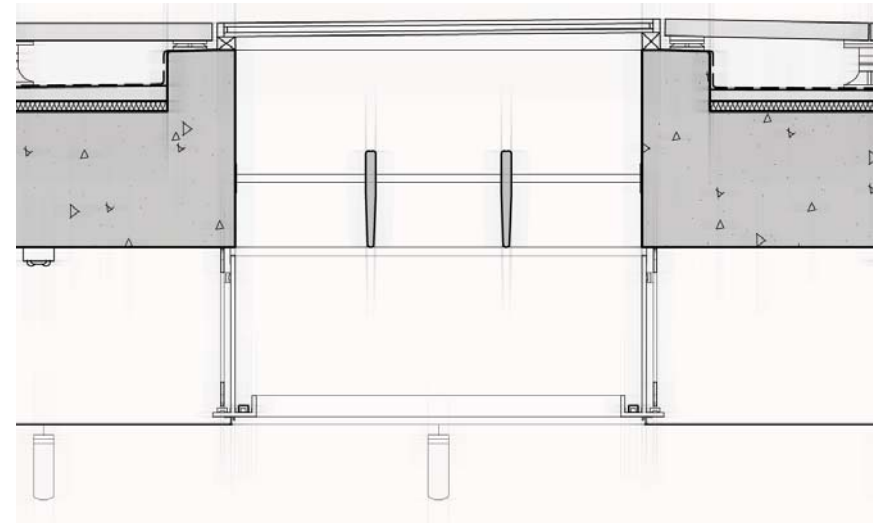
Skylight detailing and construction. Scale 1:25 (Author, 2011).
